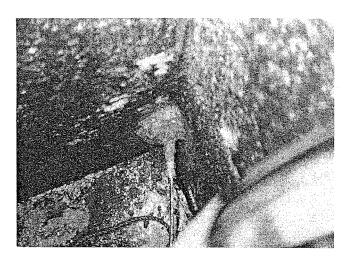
Injection port; copper tubing with valve installed in wall with oakum and hydraulic cement packed around the tubing; Barren River Lake.
